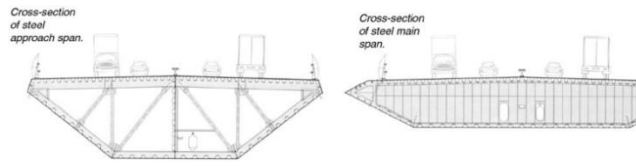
Deck cross-sections for the Storebælt East Bridge, Approach Bridge (left), Suspension Bridge (right)
